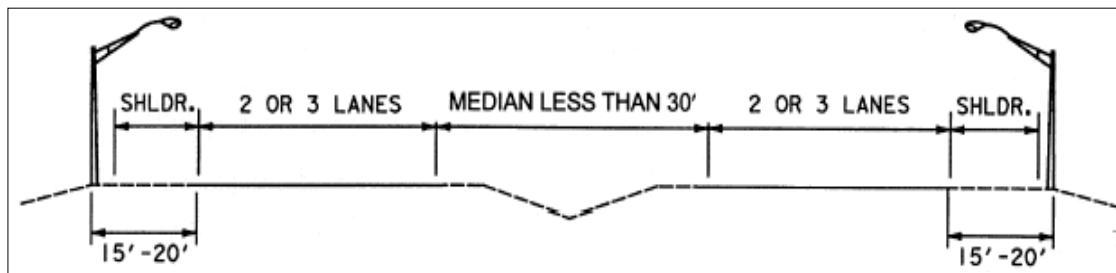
Dual Carriageway – Alternate & Staggered Configuration
